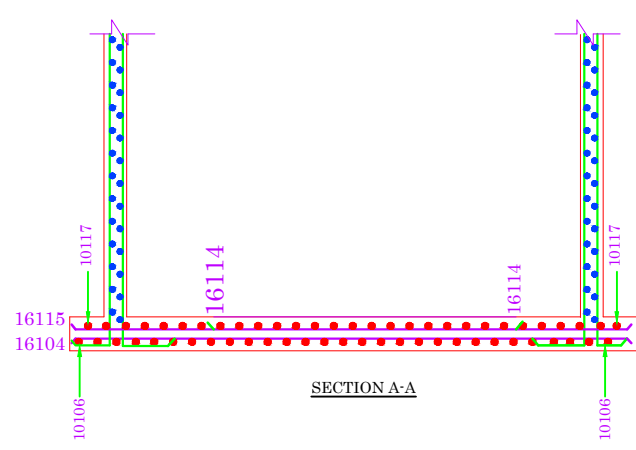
DETAILS OF REINFORCEMENT-FLOOR SLAB
